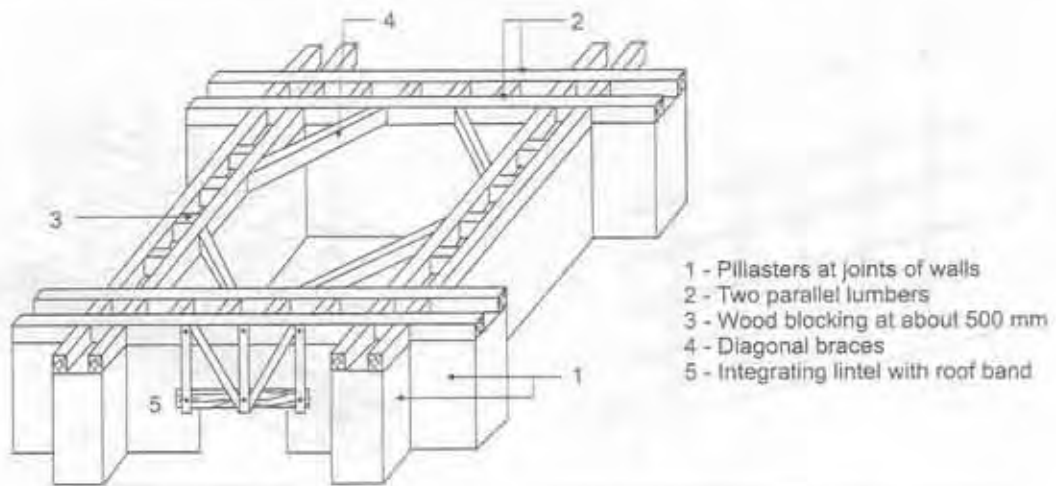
E Seismic Band Using Timber on Pilastered Walls
